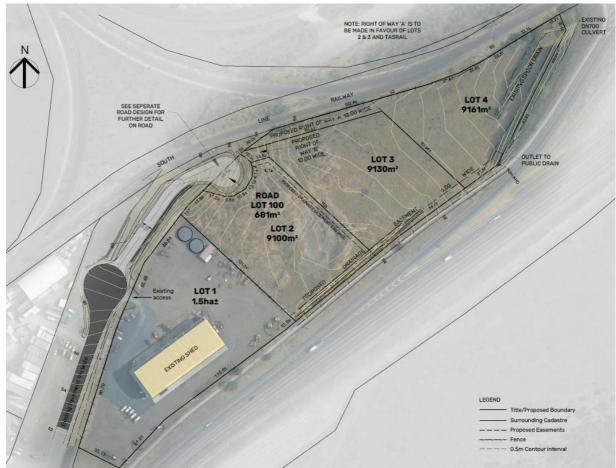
Proposed subdivision layout at 80 Possum Road, Bridgewater
